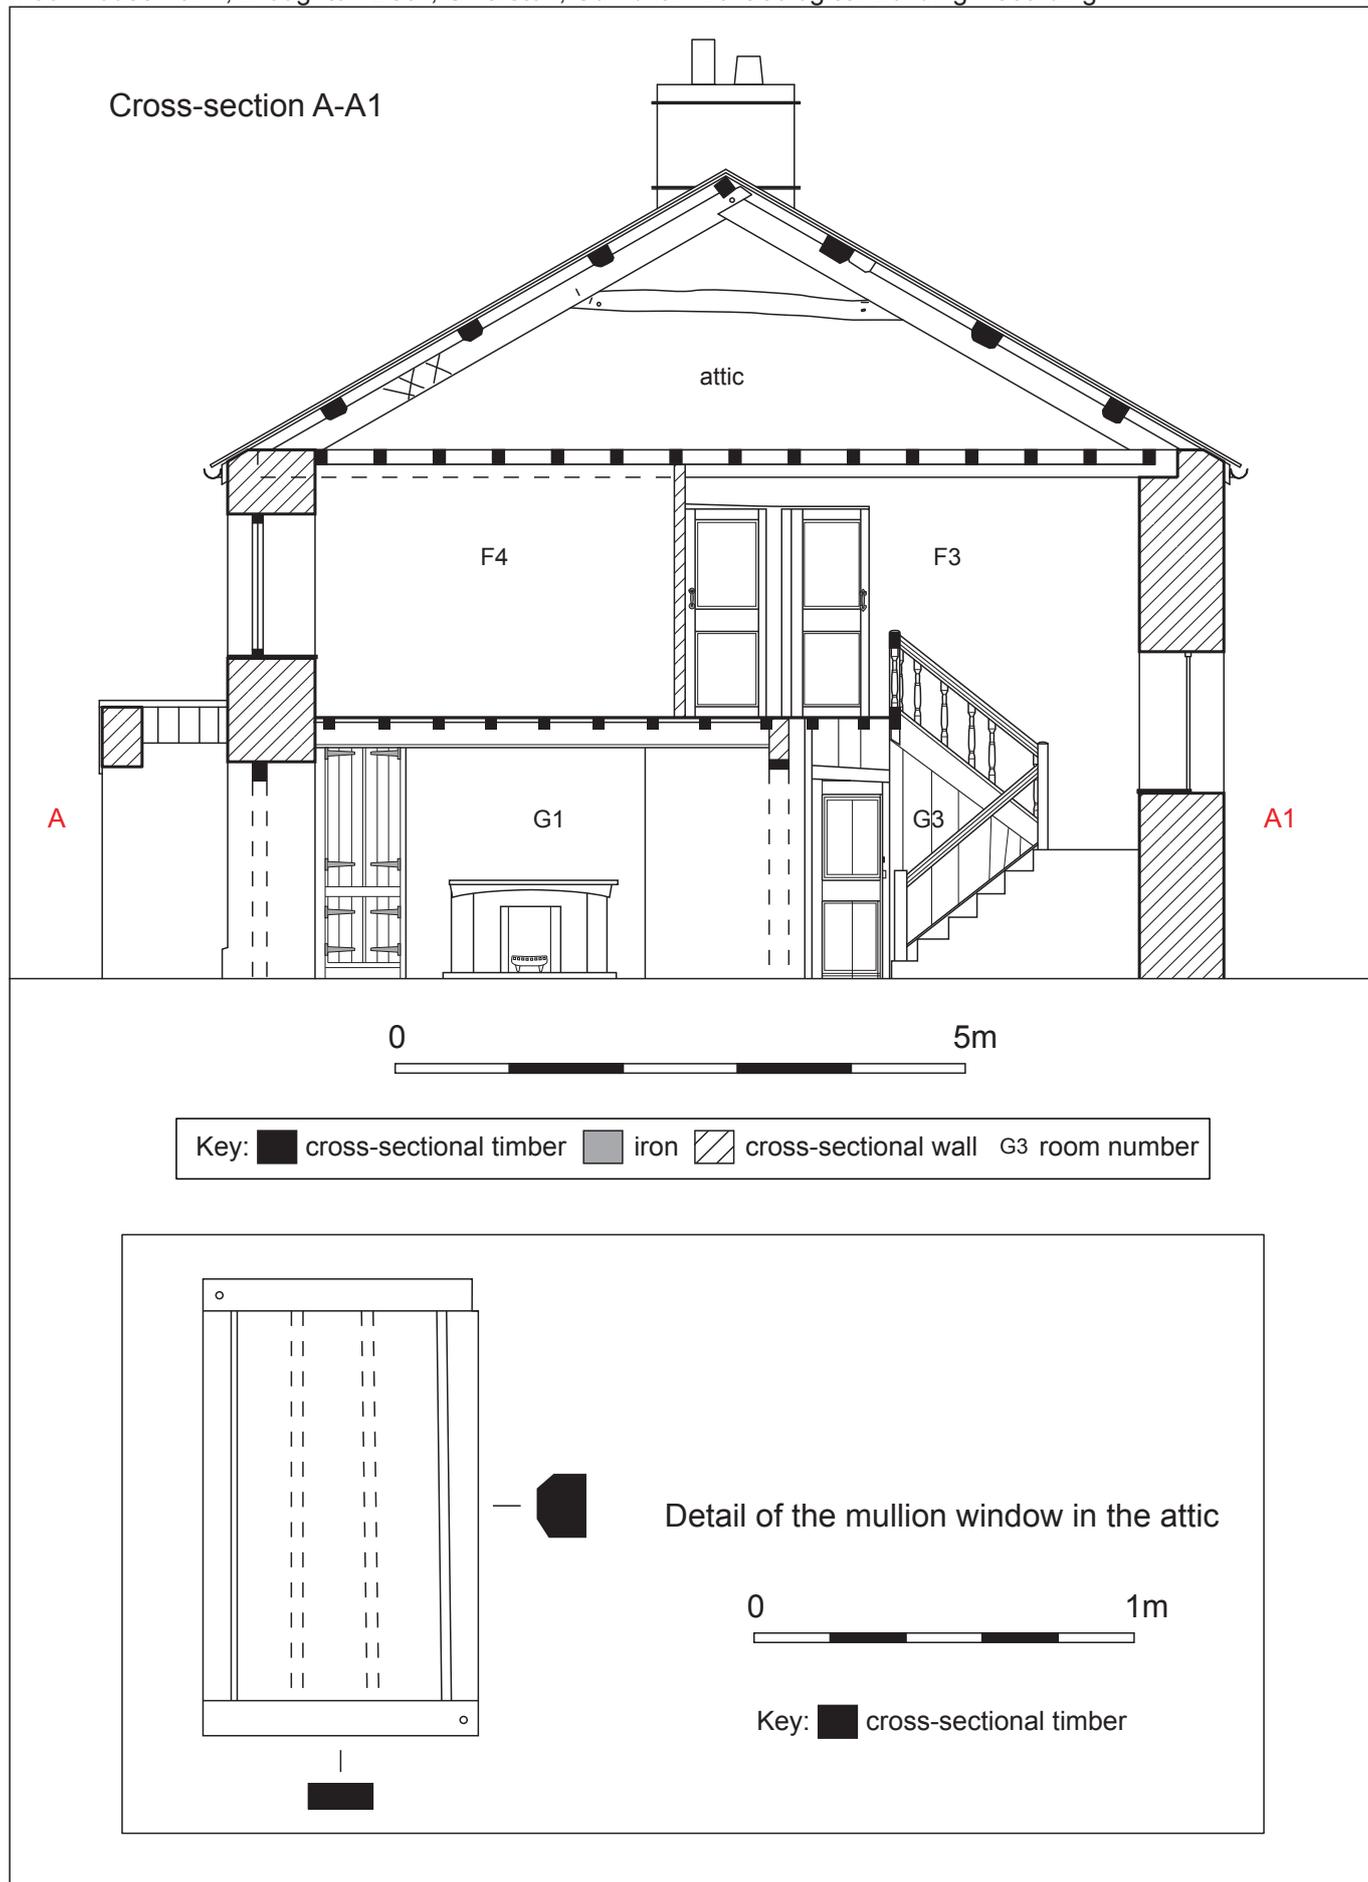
Cross-section A-A1 and detail of the mullion window in the attic
